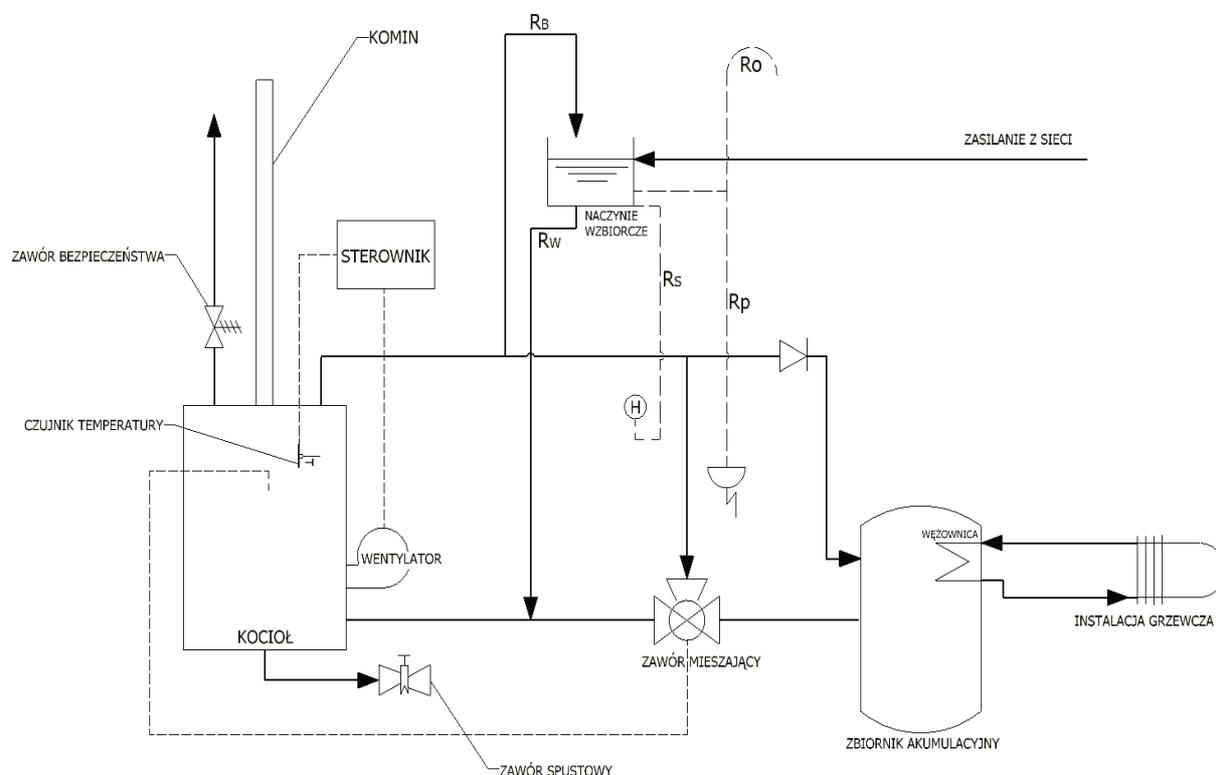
Diagram of installation protection for boilers operated in open central-heating installations
